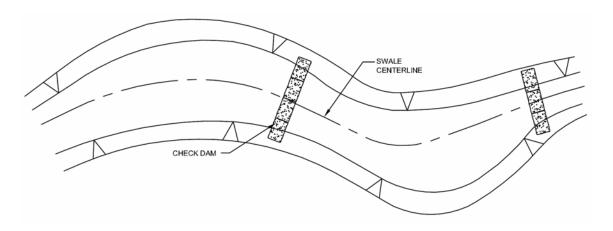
F. Alternate bioswale layout concept—typical plan view
